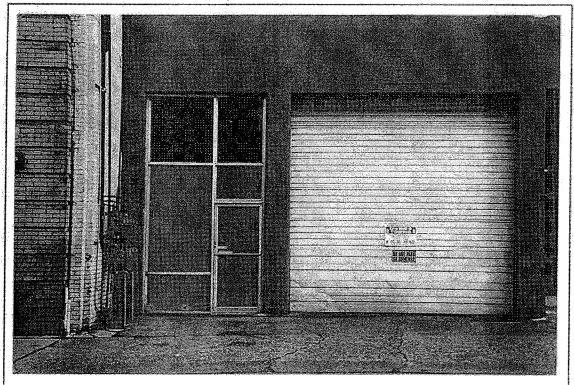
View Toward North Looking At Westerly Loading Bay (Bay 4, Southeast Corner)
